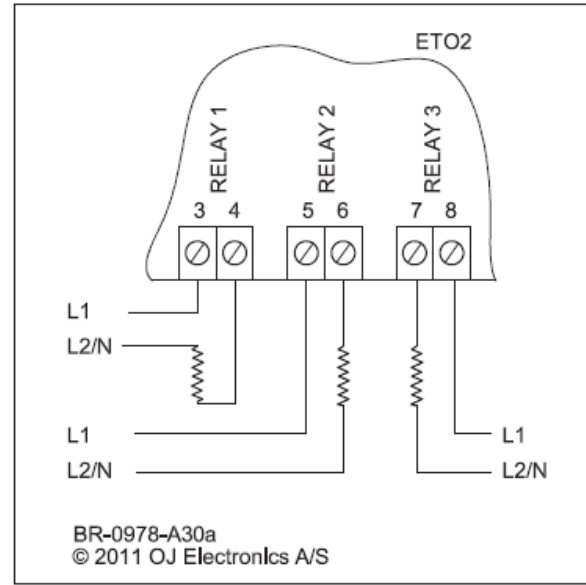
Advanced 2-step with ETOG-55. 1/3 power on heating cables in afterrun.
